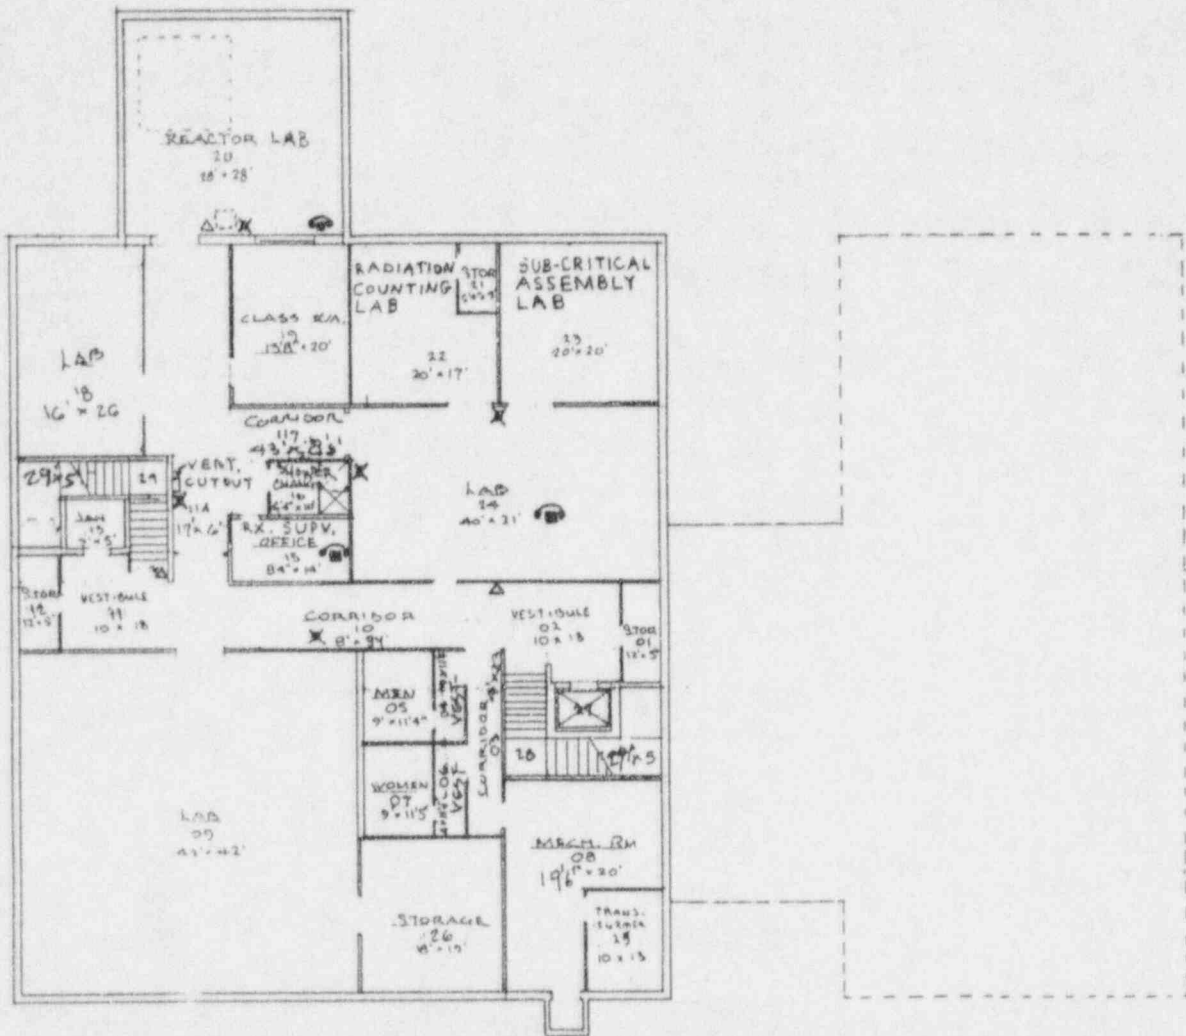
LEL First-Level (basement) Floor Plan.
